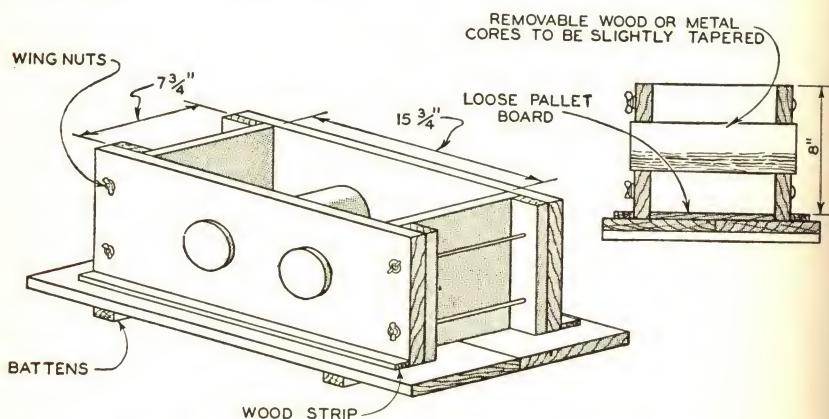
Homemade Wood Forms for Making Concrete Blocks
